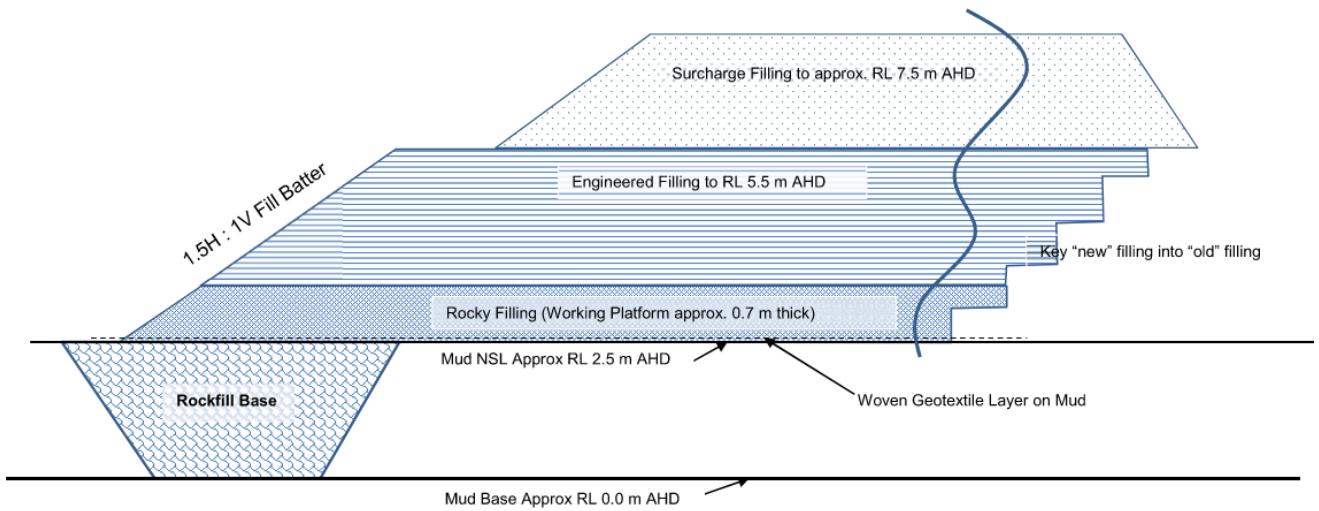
Proposed Filling and Pre-loading design of Lot's A and C
